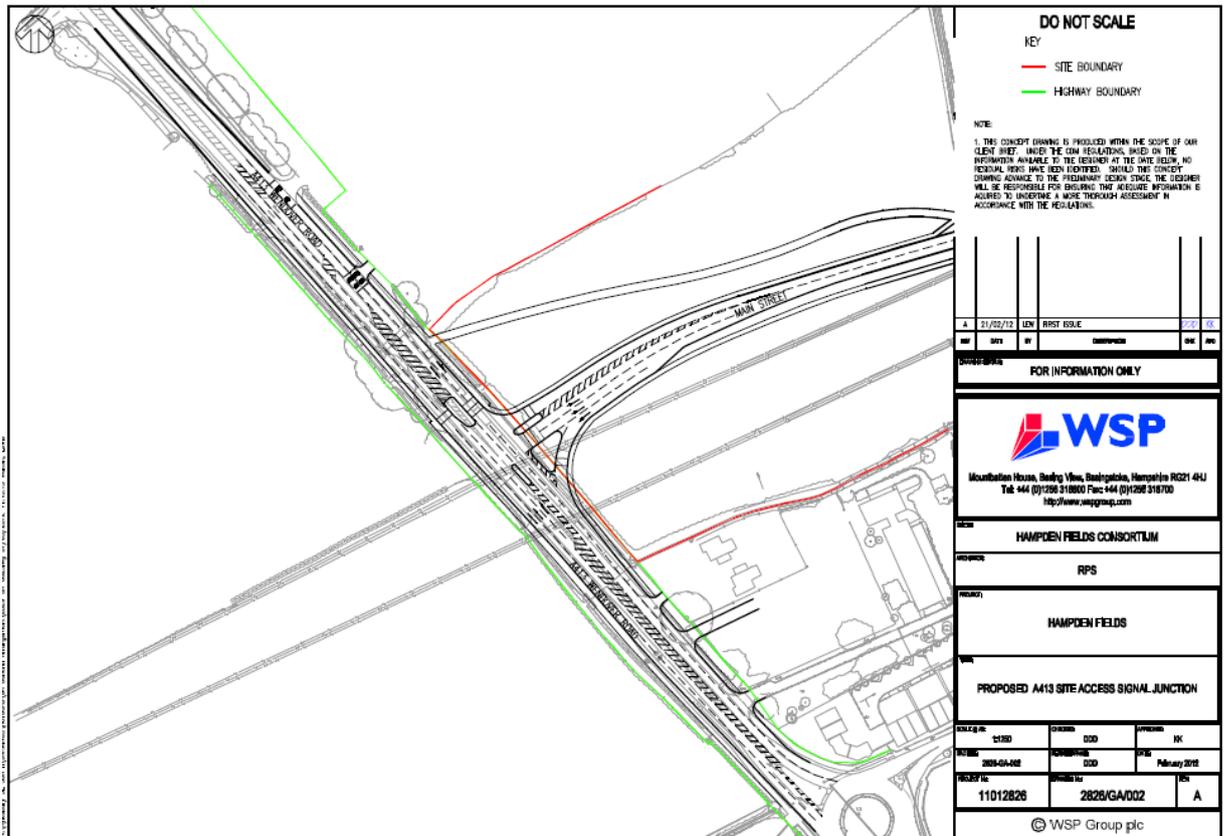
A413 Wendover Road / SLR Hampden Fields standalone signalled Layout
